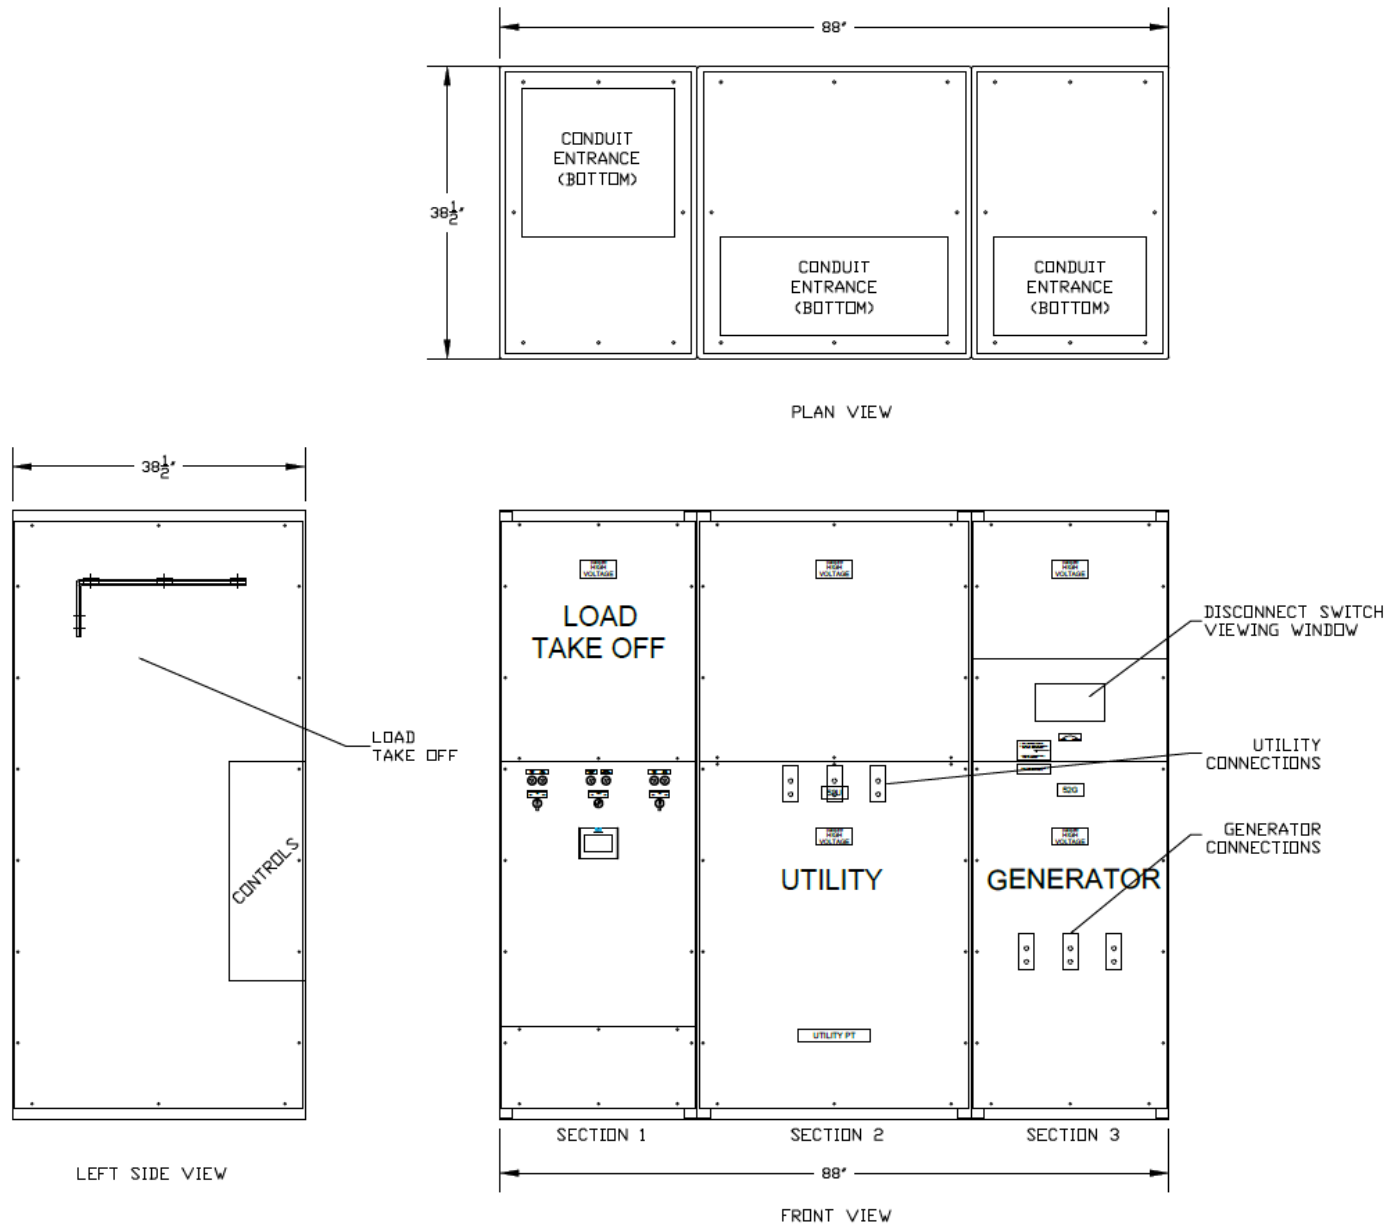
5-15 kV Metal-enclosed Switchgear Front, Side, & Top Views – Dimensions
